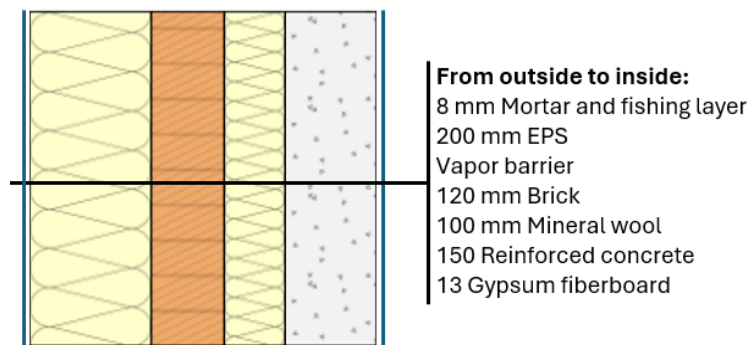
Details of proposed exterior concrete wall at Blåsutgatan 8.
